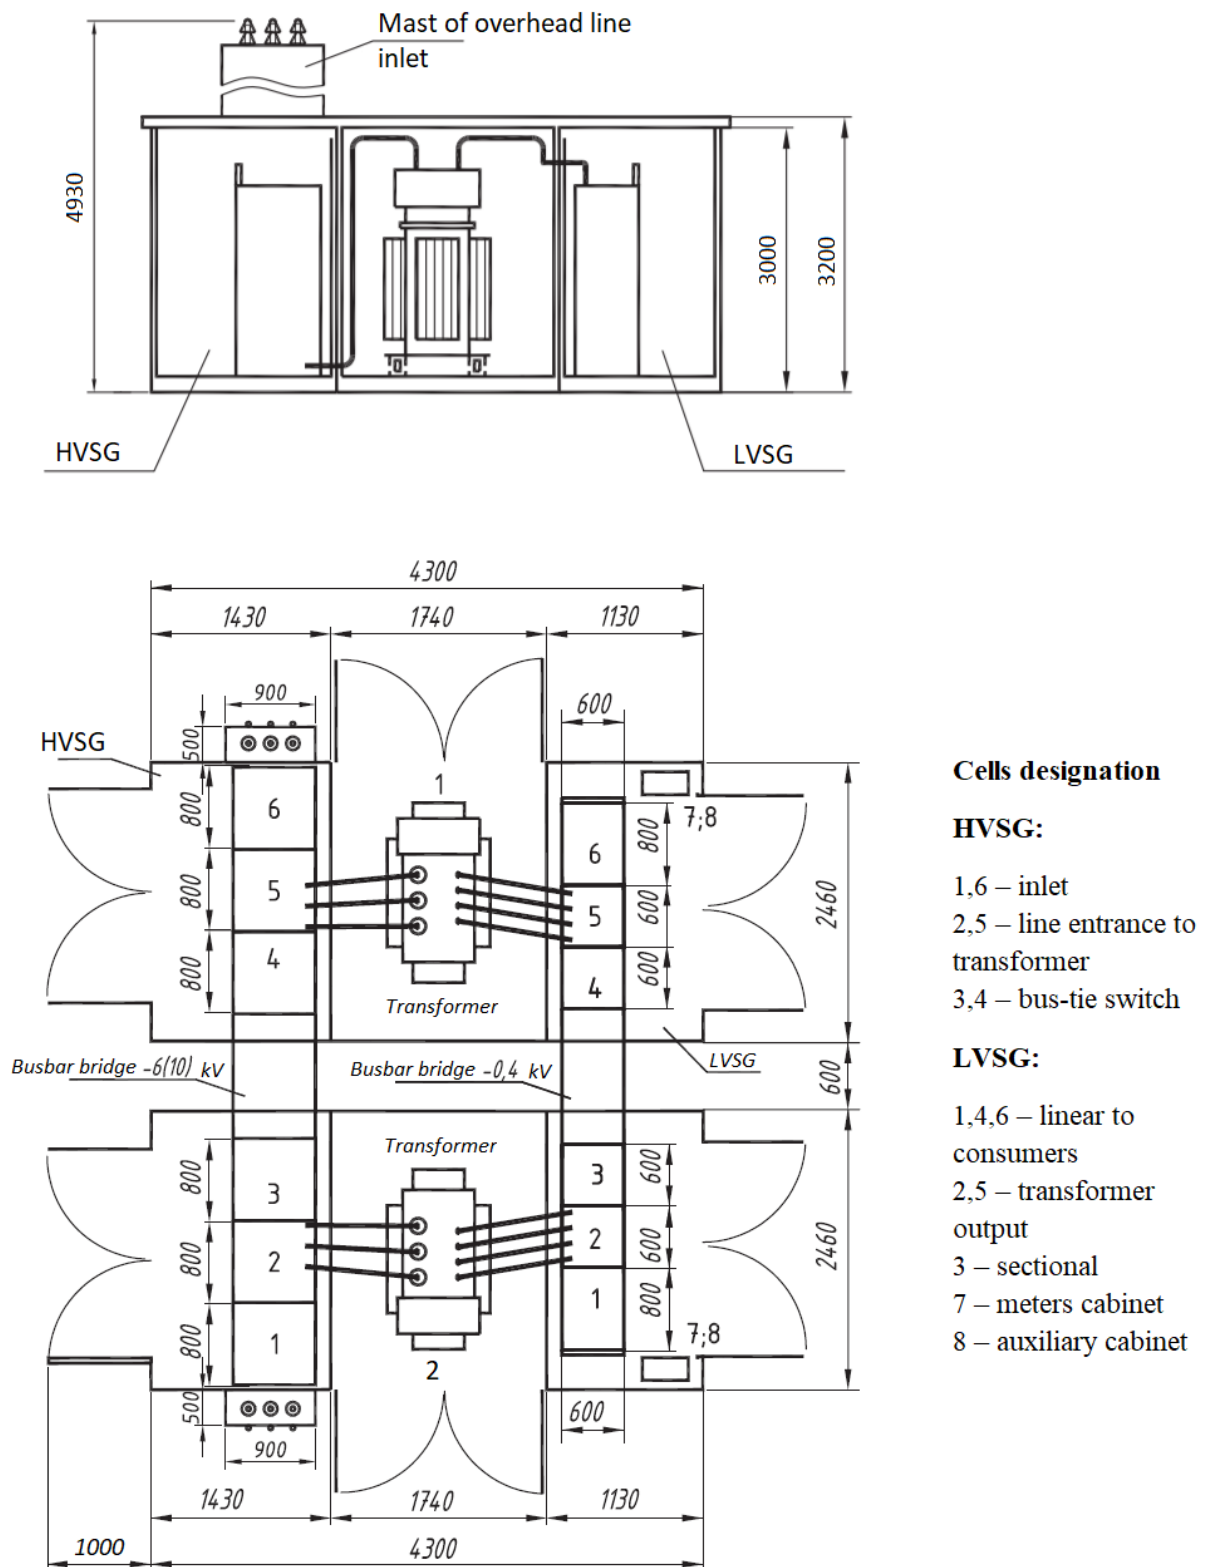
The layout and dimensions of standard indoor transformer substation with air inlet and sectioning on HV side
